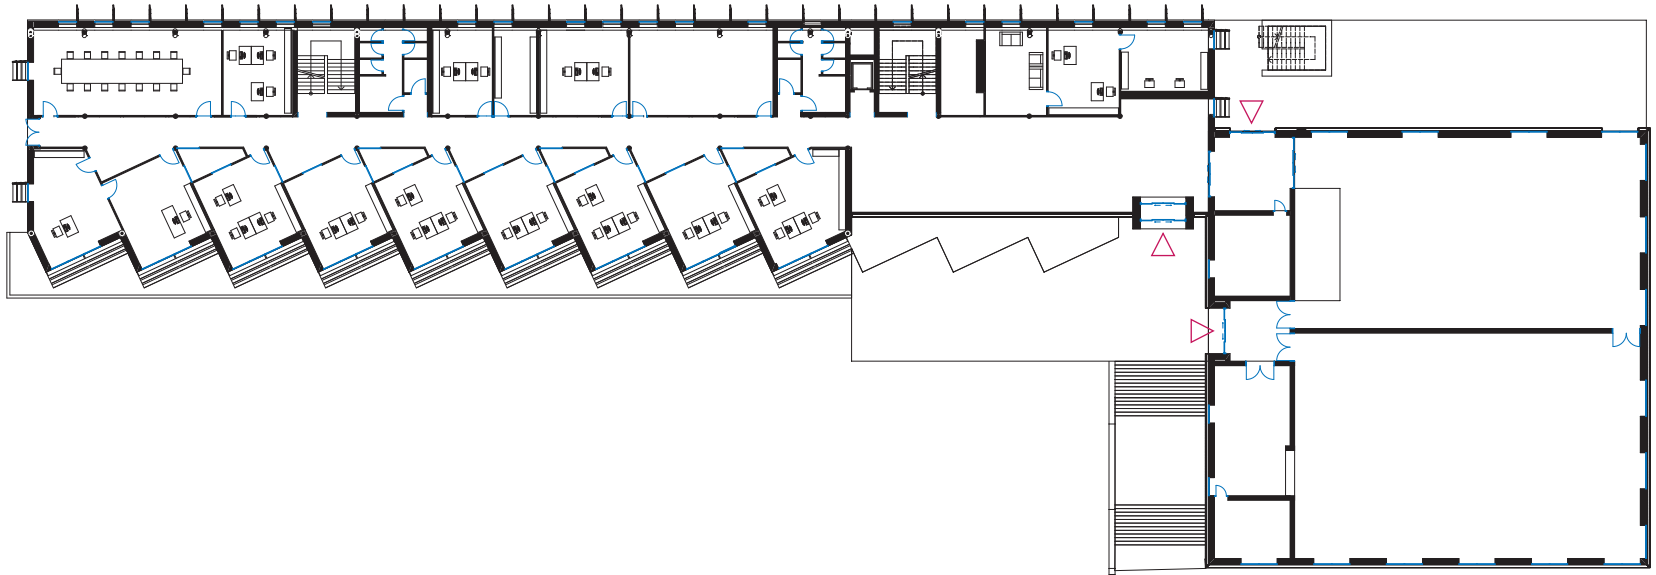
Ground floor plan of the New Generation Office Building (Scale 1:500)
